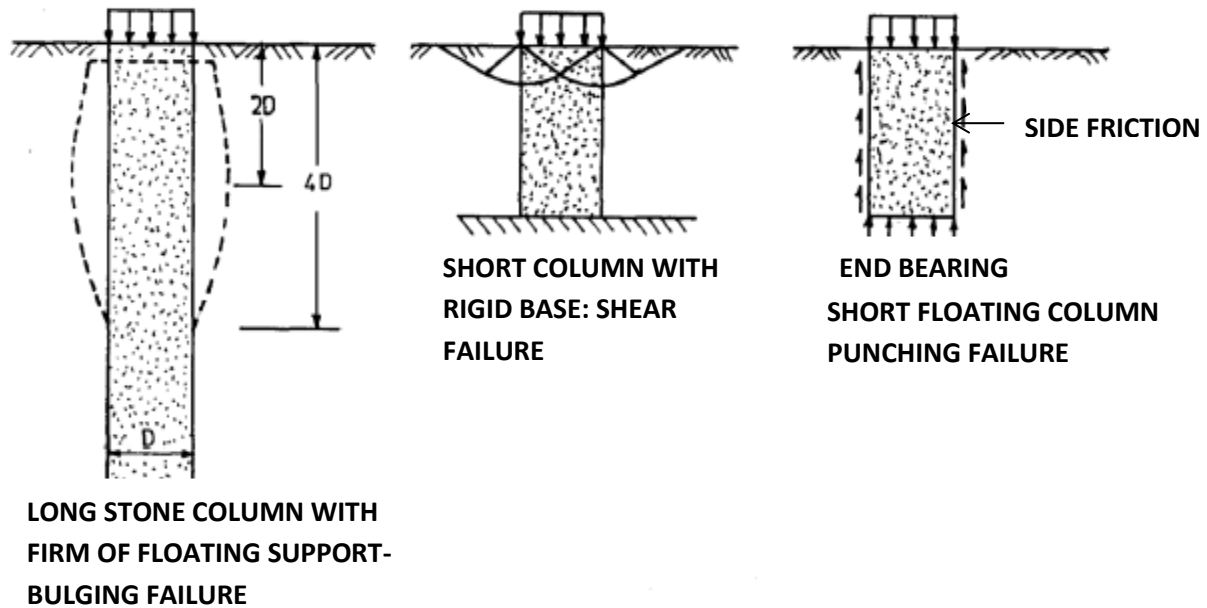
Failure mechanism of single stone column in a homogenous soft layer
